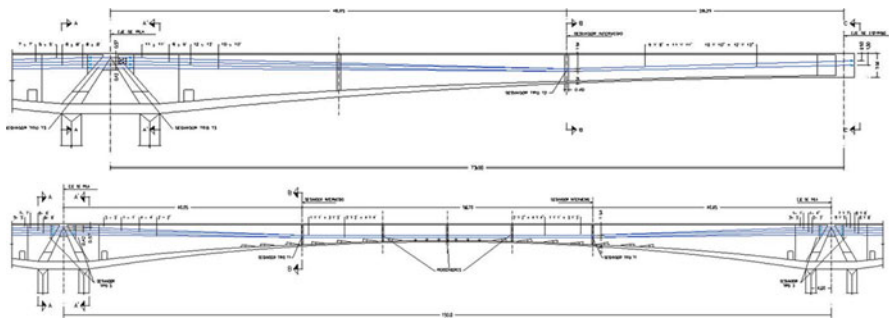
External strengthening prestressing arranged at the interior of the existing box section
